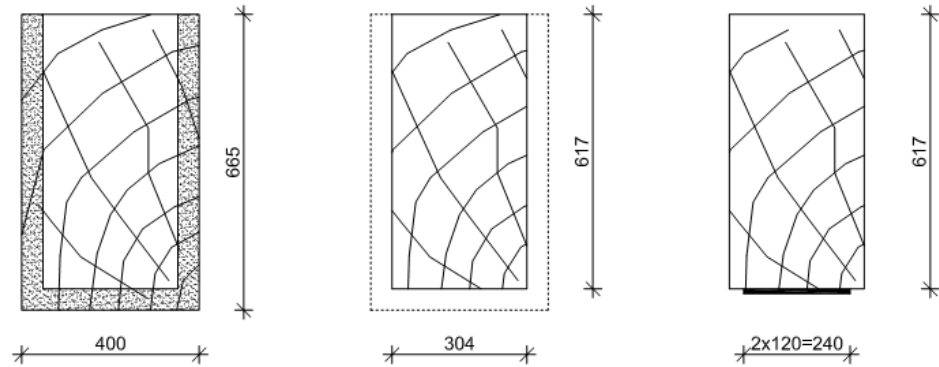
Cross-sections of beams made of wood after reinforcement. Prepared by Ferenc Szabó.
